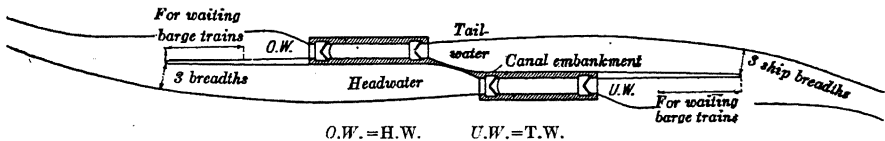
Separating arrangement of locks to be used in mining districts and the like
